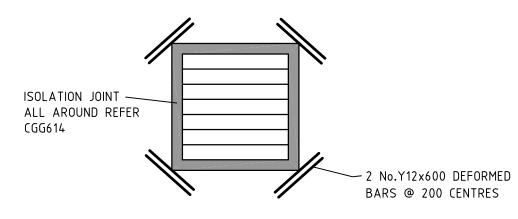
EHL-11B-20 Sheet No. 20 of 22
